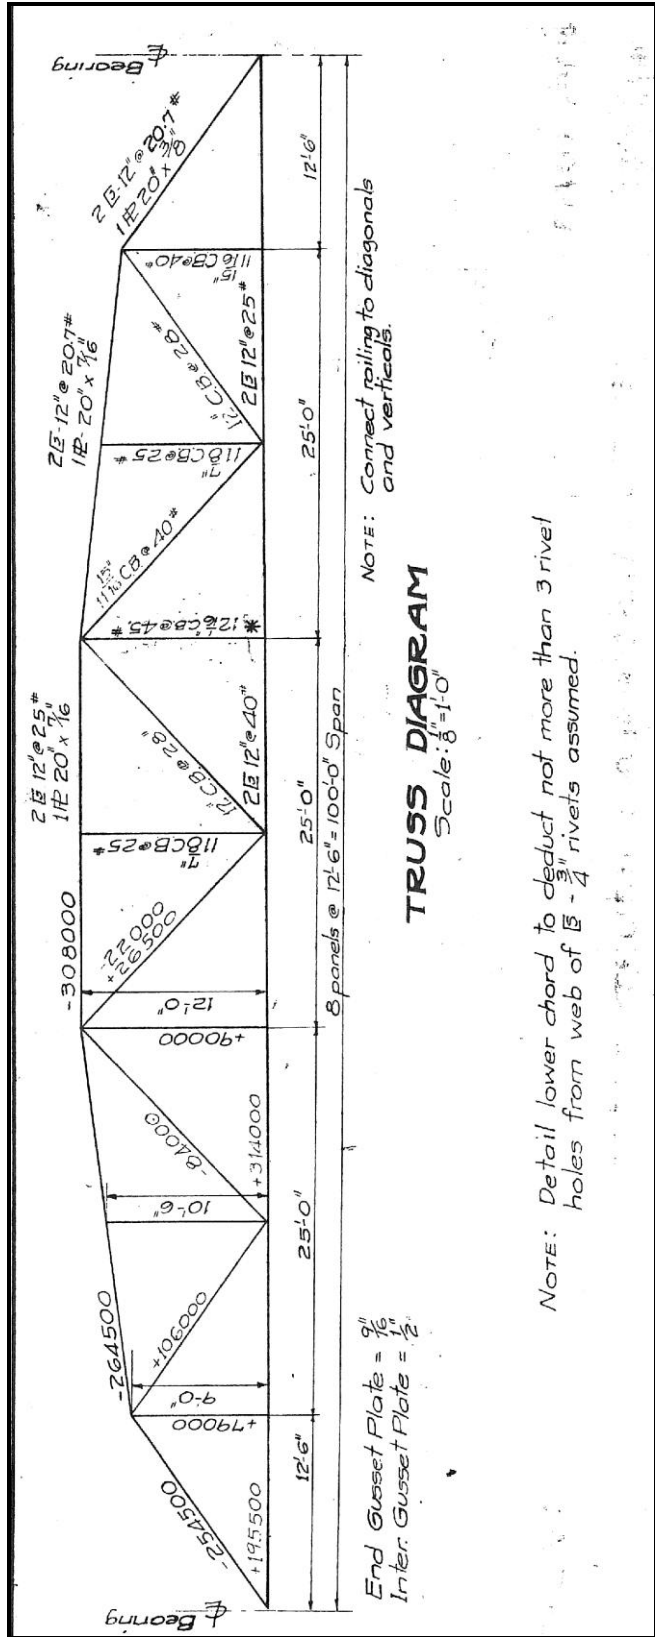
Elevation of a standard superstructure of a steel pony truss designed by the State Road Commission
